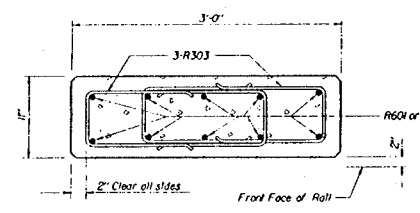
Natchez Trace Parkway Concrete Bridge Railing (50,51).
